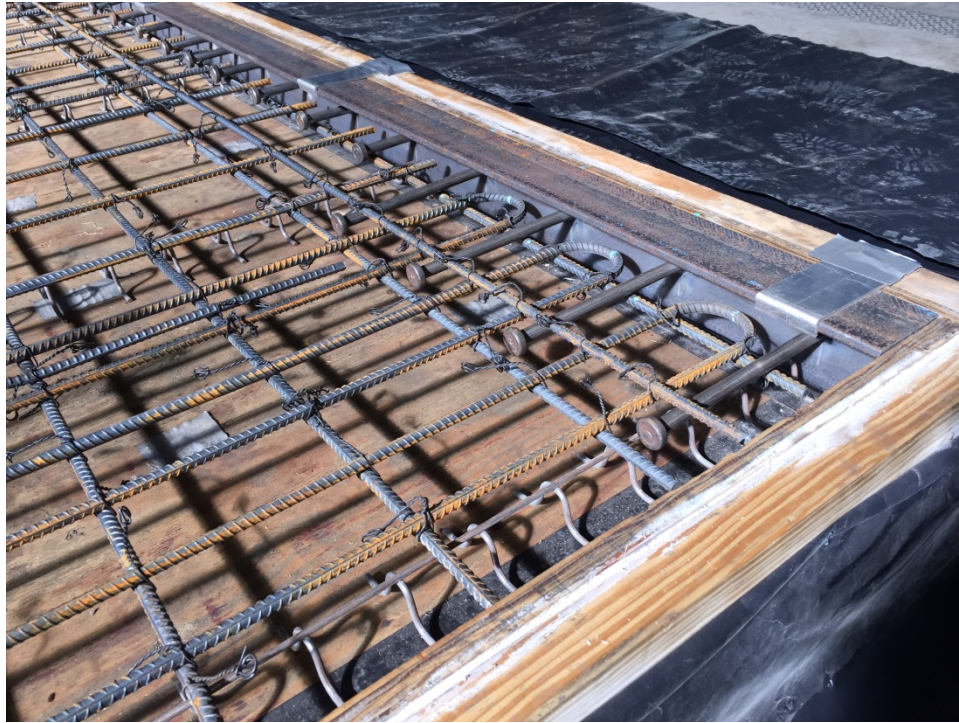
Detail of Corner Reinforcing in PCP for Test 5 and Test 6
